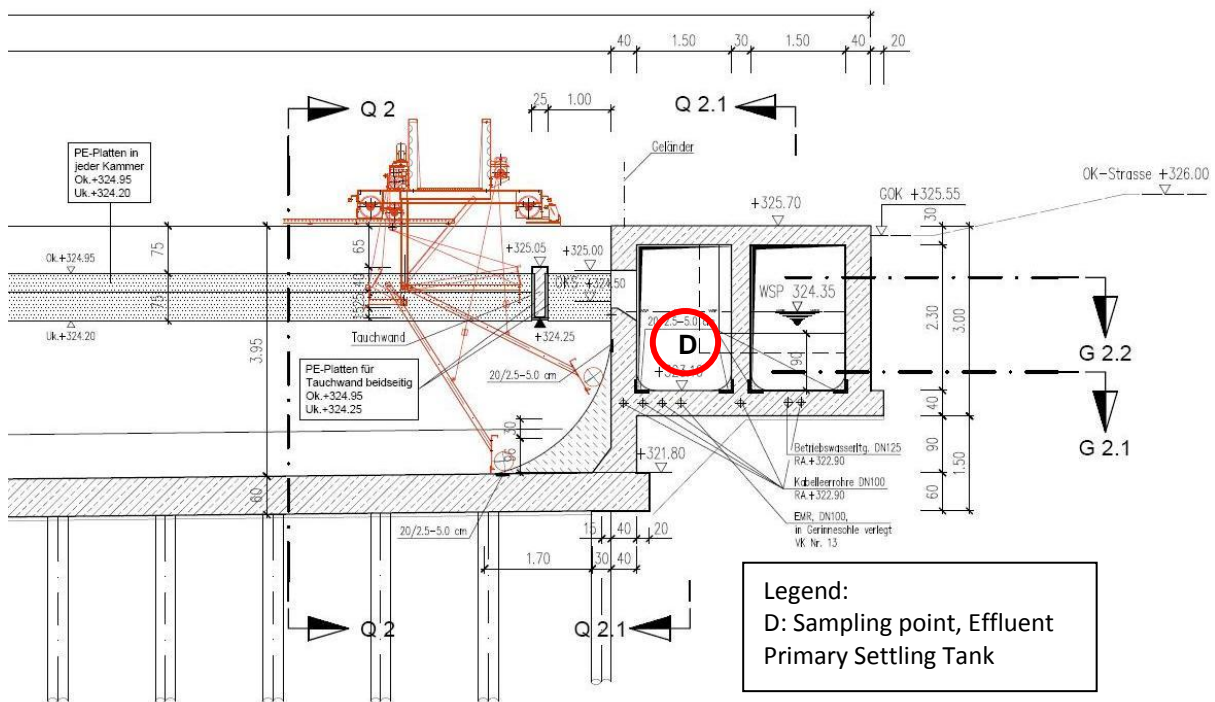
Position of sampling in cross-section – Outlet Primary Settling Tank
